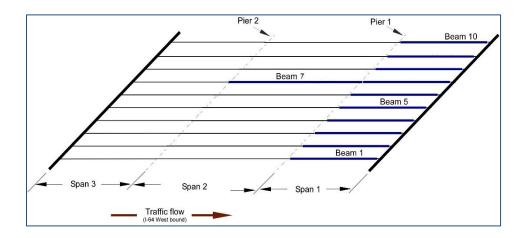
General diagram of the bridge showing the steel girder (beam) layout.
